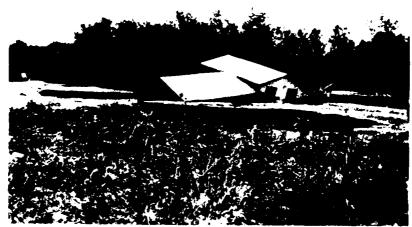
Looking downstream from Snyder Hill Road at River mile 99.7 at house damaged by the flood. Photo taken in 29 June 1972.
